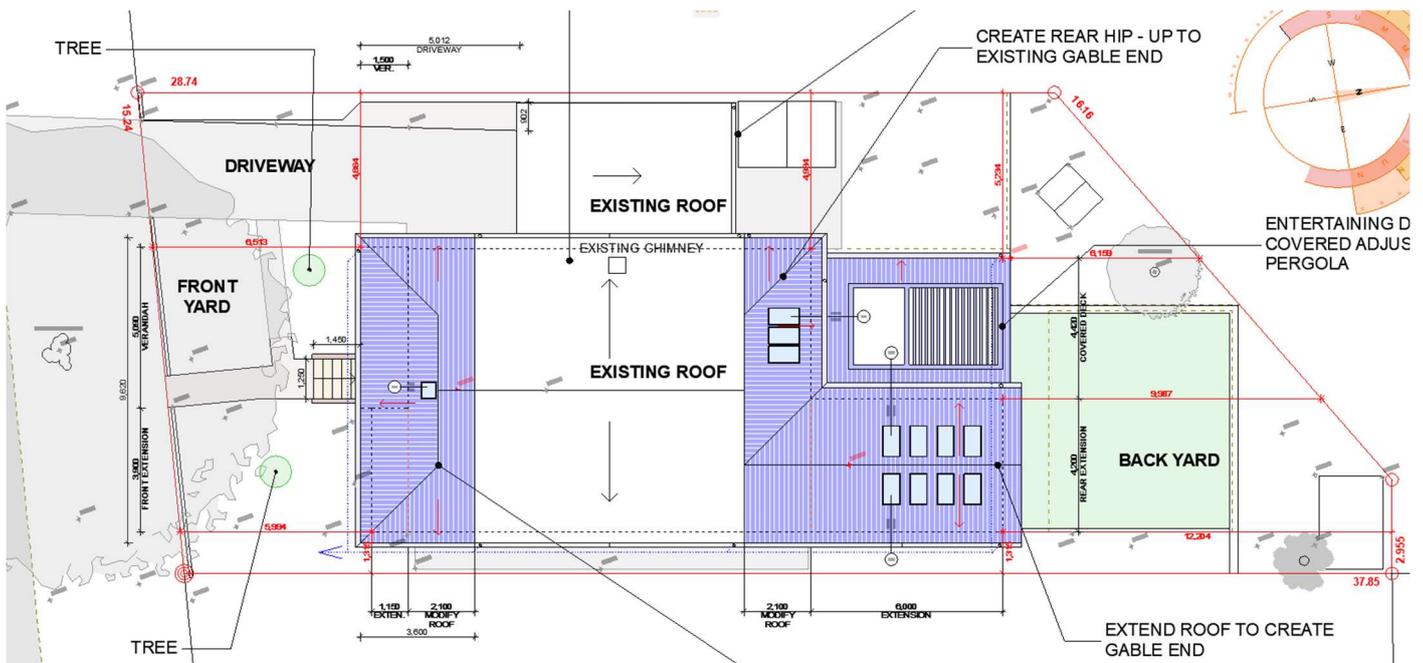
Extract of Site / Roof Plan depicting the setbacks in RED dimensions.
